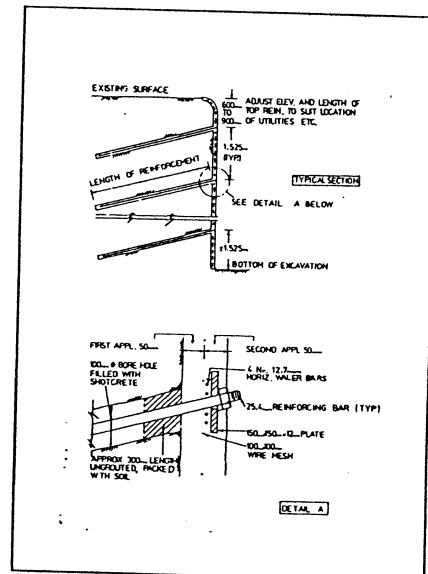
Details of the soil nailing at the Good Samaritan Hospital site (Shen *et al*, 1981a)
